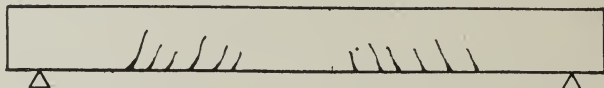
Failure of Reinforced Concrete Beam by Diagonal Tension.
